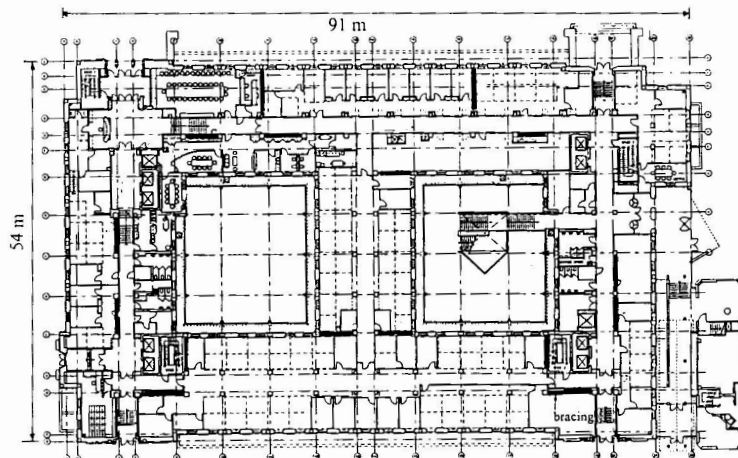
Typical Floor Plan. Bracing with Friction-Dampers shown in thick lines.
